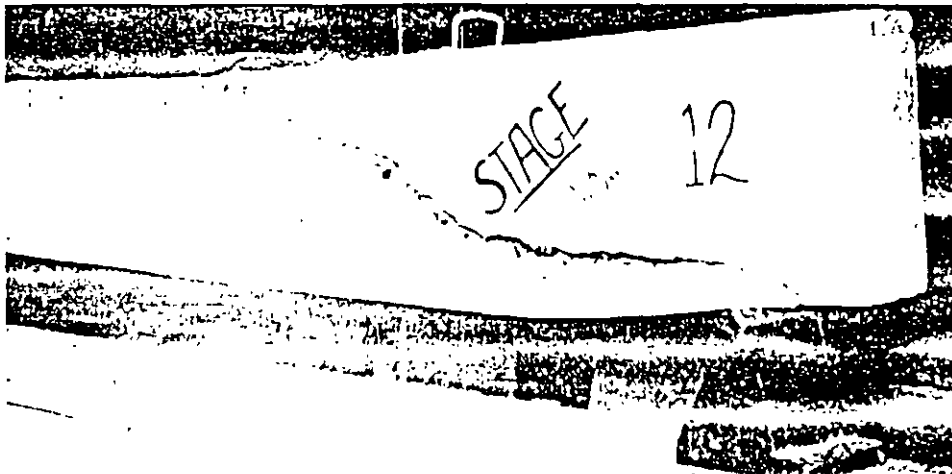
Principal diagonal tension crack at failure of beam in the preceding photograph (load stage 12).
